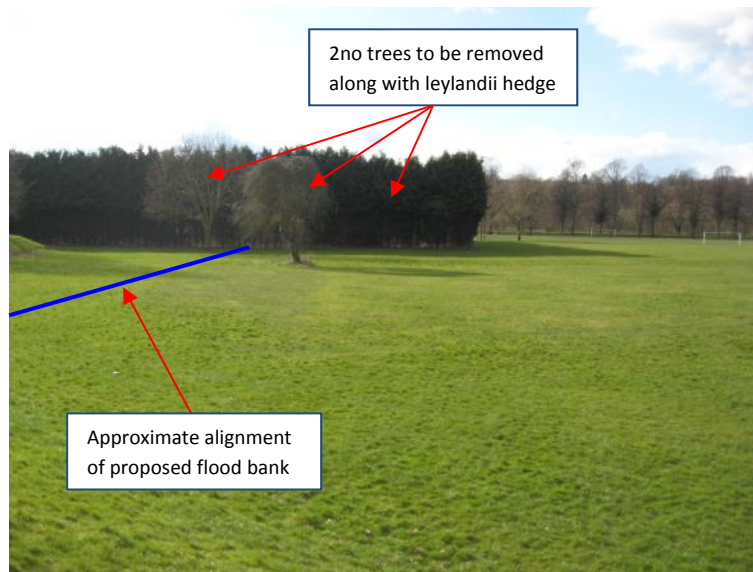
Proposed layout of flood bank at Darley Playing Fields South
